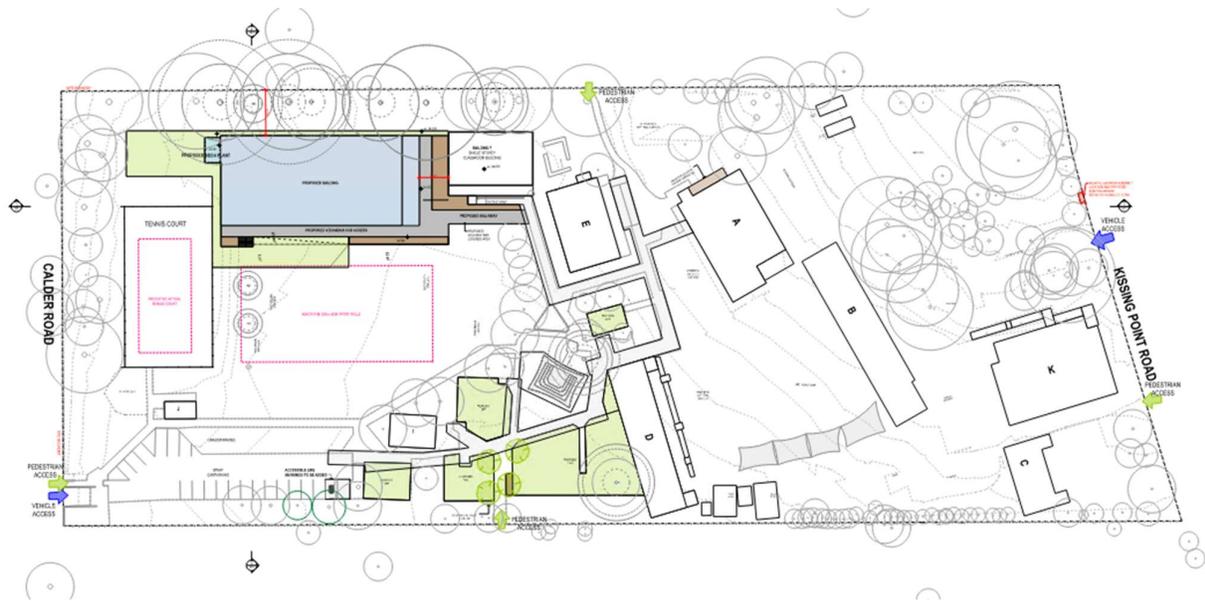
Proposed Scope of Works – (Source: Fulton Trotter Architects, Proposed Site Plan (Rev 04))
